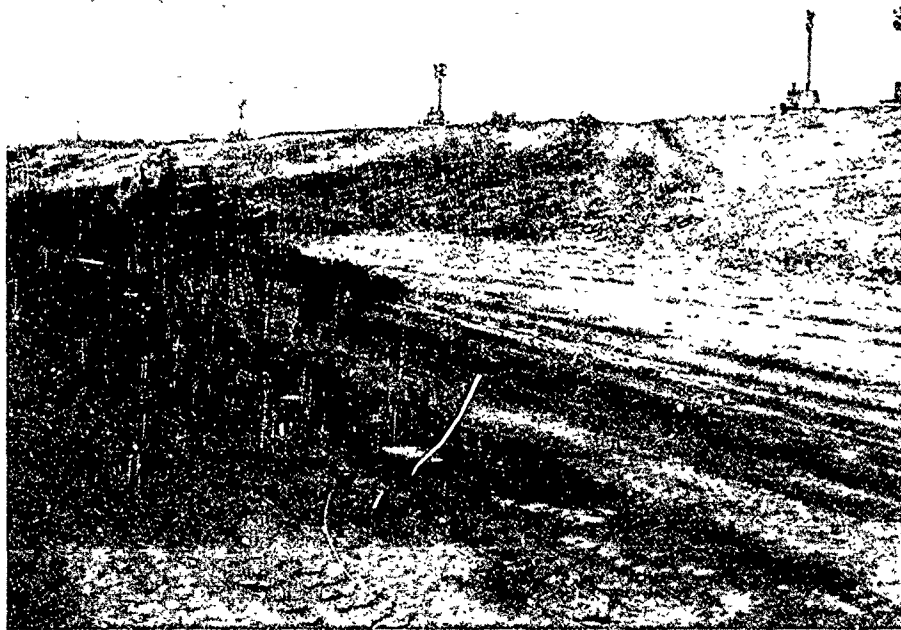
Outlet works excavation, right side looking downstream. Placing fill on fresh shale surface.
